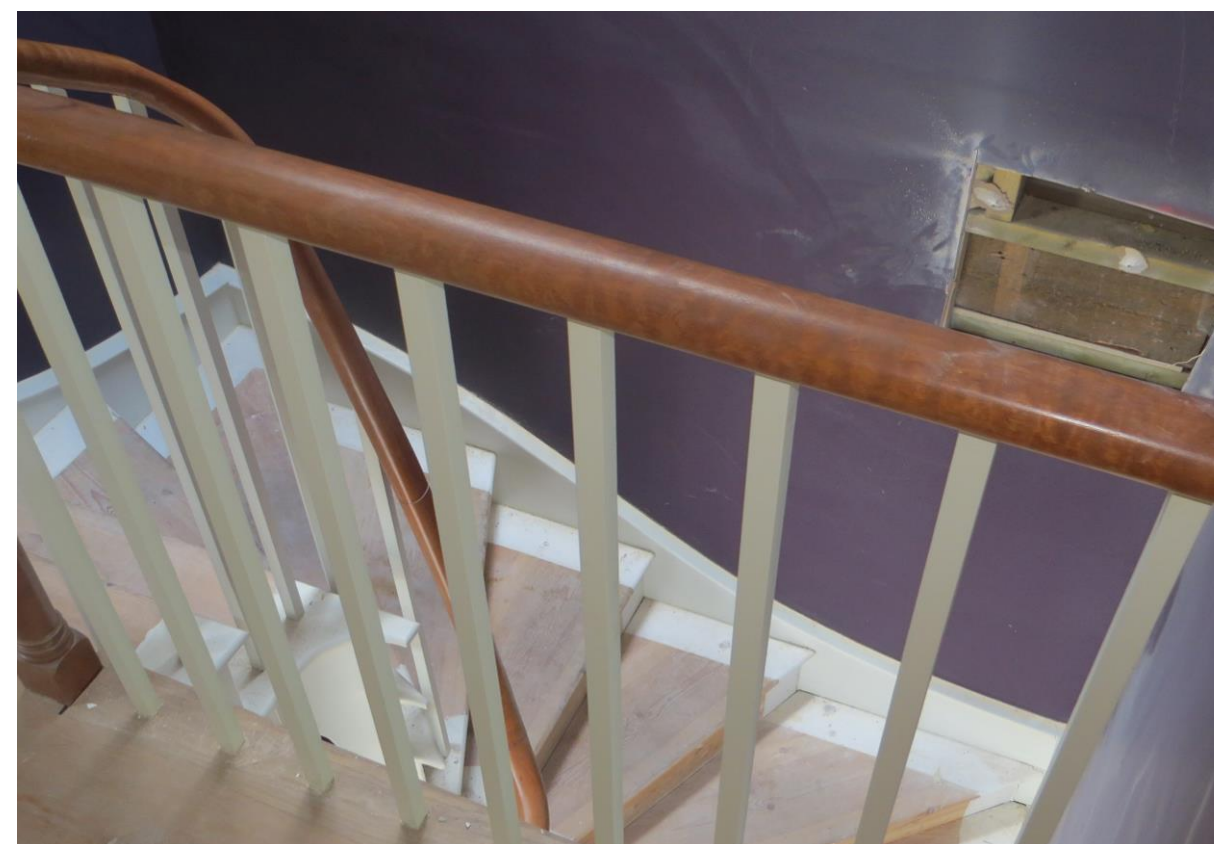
Staircase between second and third floor, poorly constructed and currently unstable.
